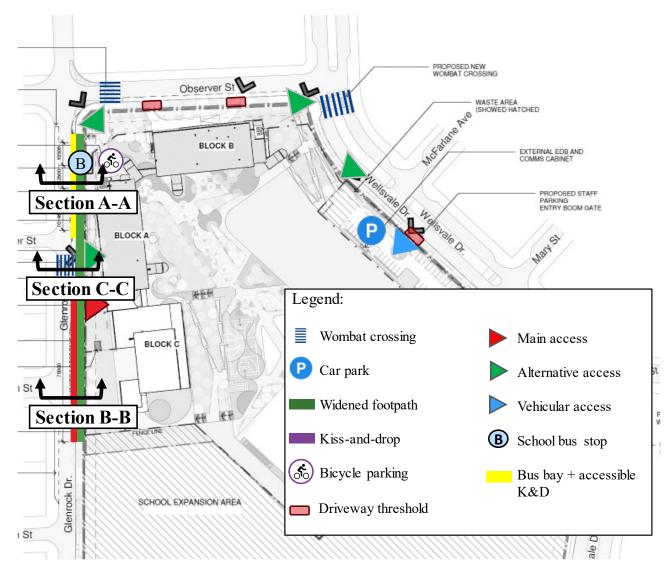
Location of road sections A-A, B-B and C-C on Glenrock Drive
